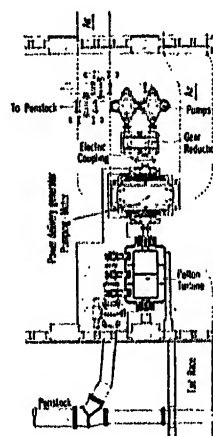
PUMP CONNECTED TO A HORIZONTAL SHAFT UNIT
